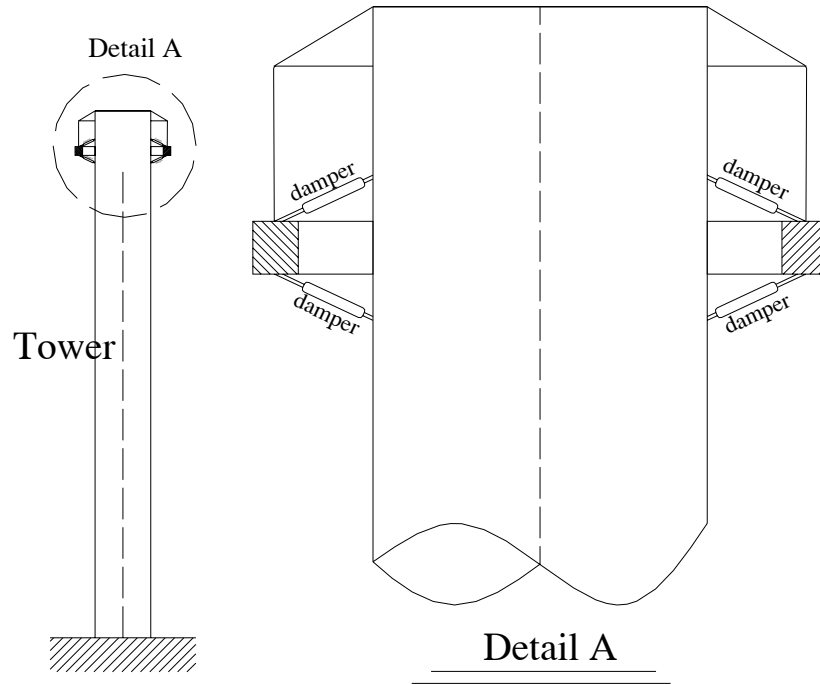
The tower is damped by using a pendulum ring connected to the tower by hydraulic dampers
